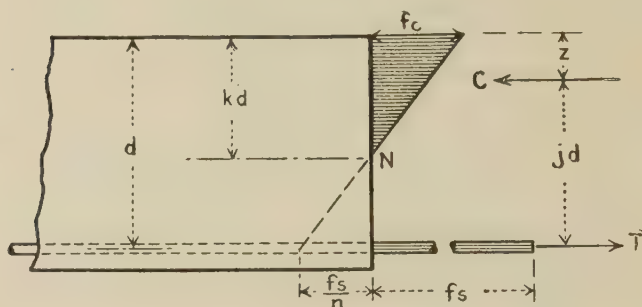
Nomenclature for Concrete Beam Reinforced for Tension.
